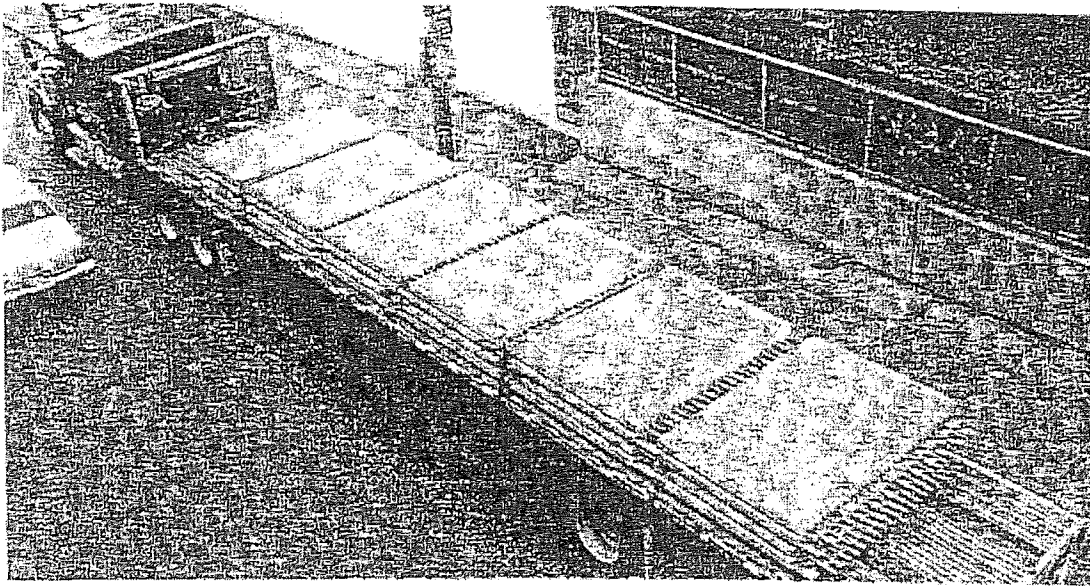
38 ft x 8 ft Precast Exodermic Panels Being Delivered to Job Site (4)
